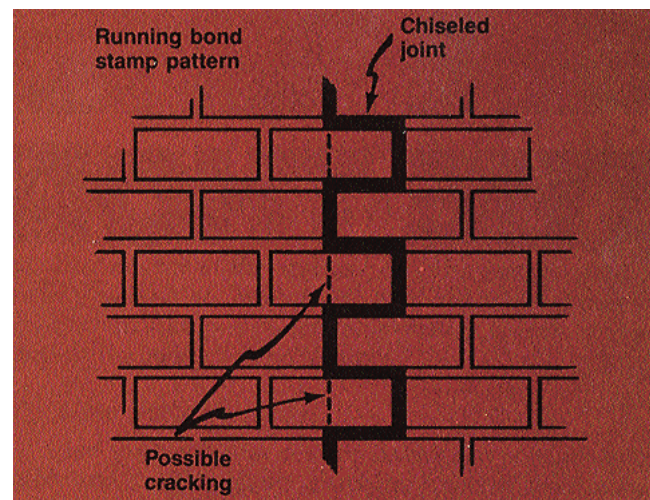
If the owner wants joints to match the pattern, warn him of possible cracking as shown in the sketch. Jointing methods should be considered early in the planning stage.
